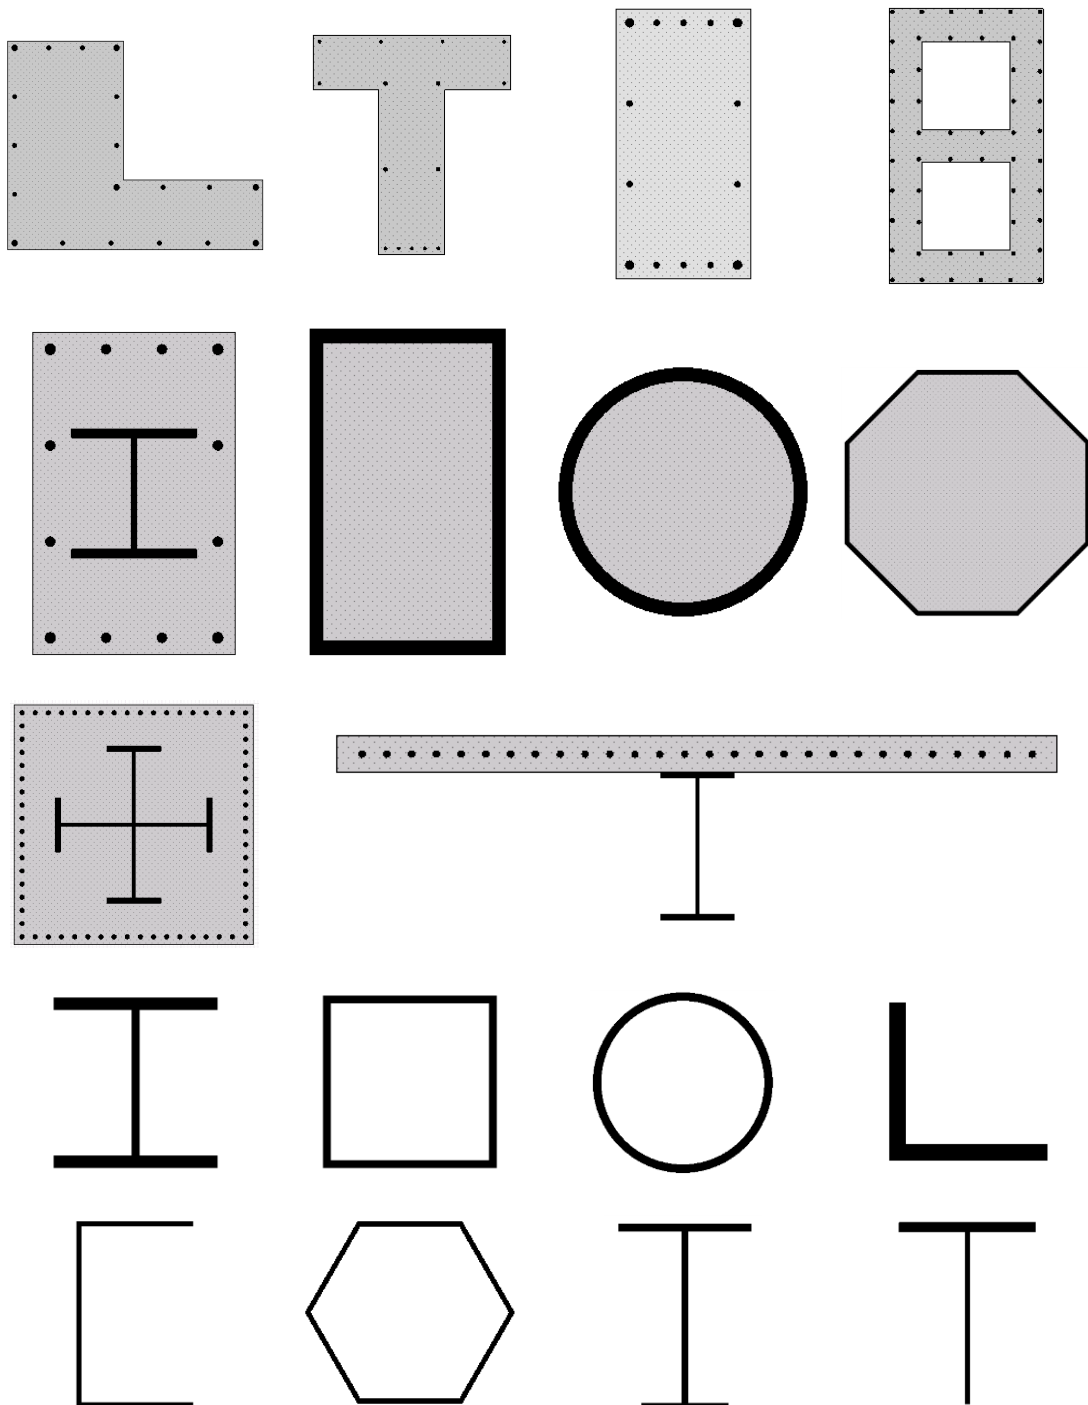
Common sections in a hybrid steel and concrete framed structure
